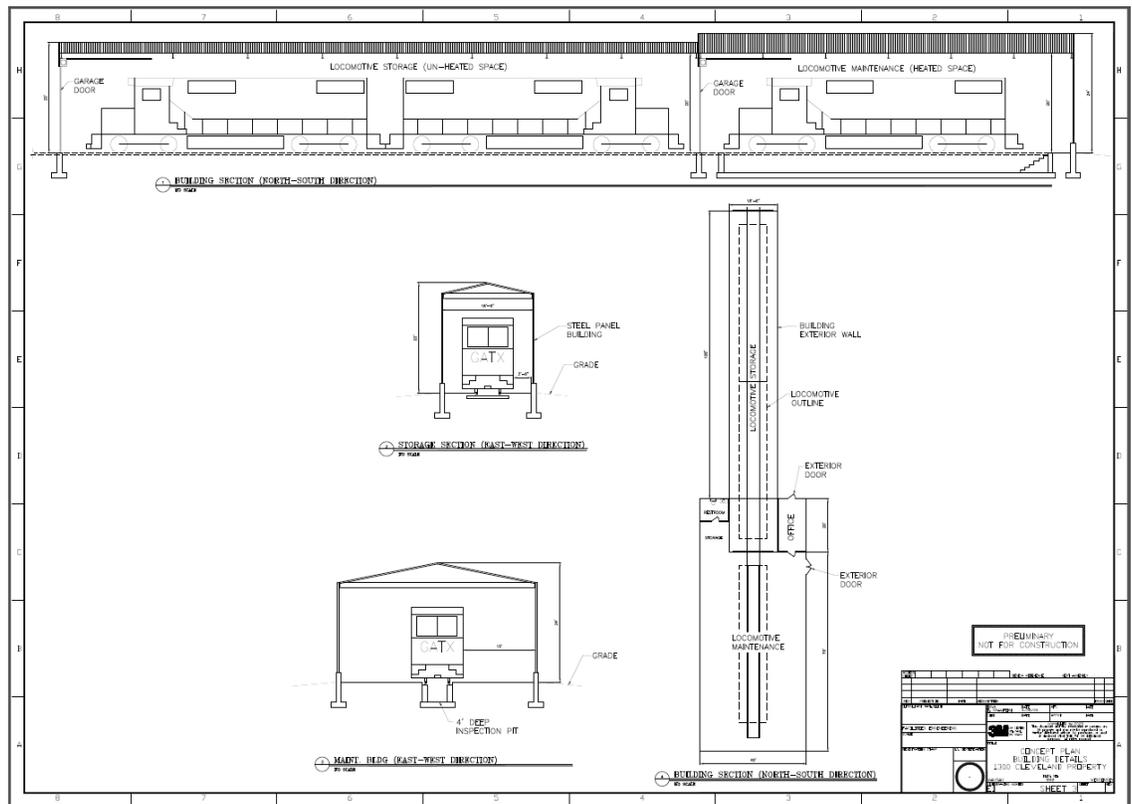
3M Wausau Locomotive Storage Layout
